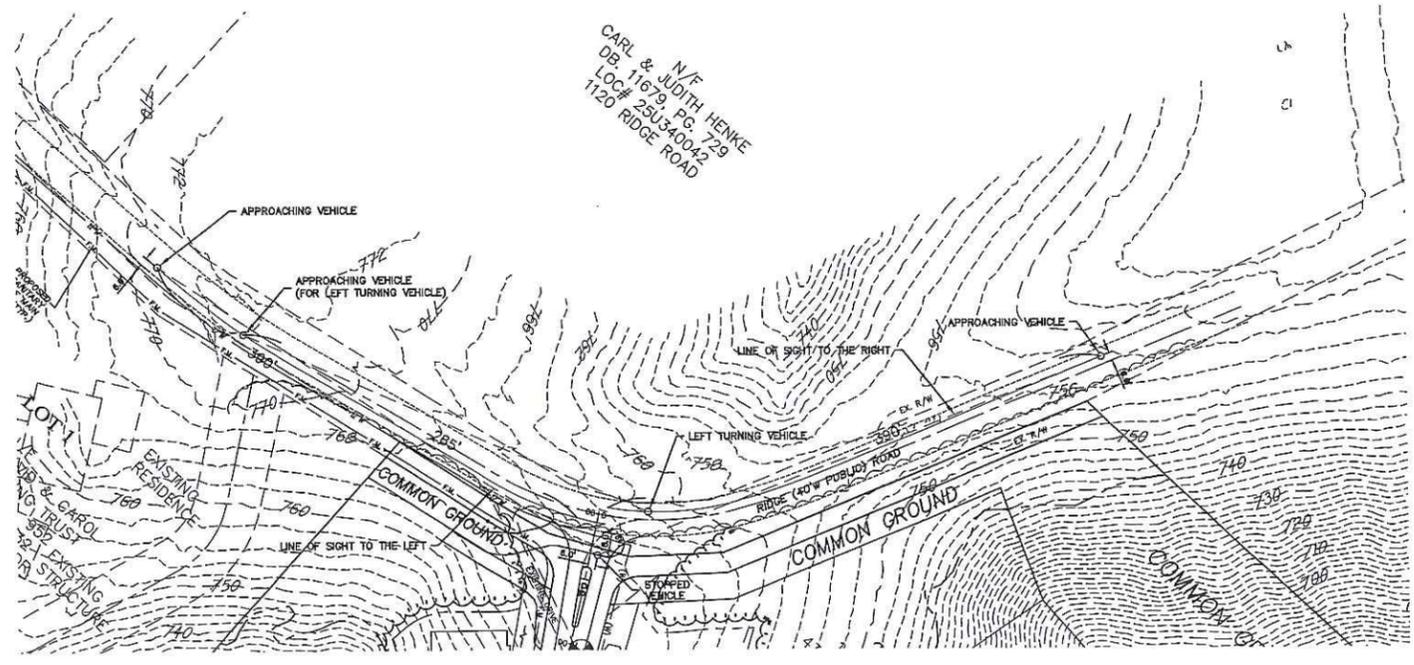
Aur Ridge Development Plan - Preliminary Development Plan - Natural Resource Protection Plan - 07/28/16 - 3.1 - Fischer & Frichel Custom Homes, LLC
